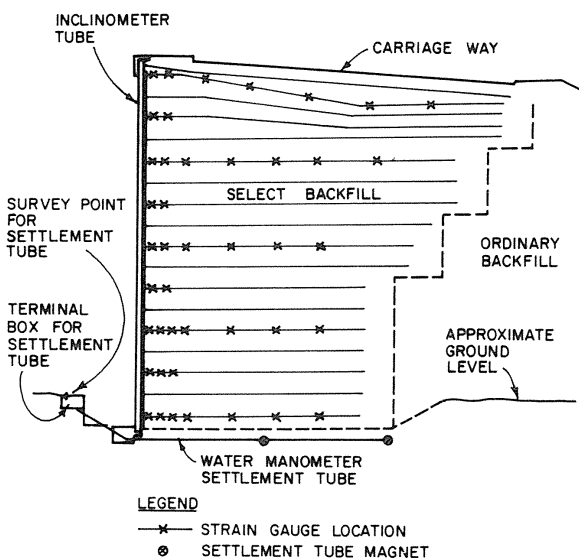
Ngauranga Reinforced Earth Wall, Instrumented Section (Section through wall). (After Yong and McLarin, 1985.)
